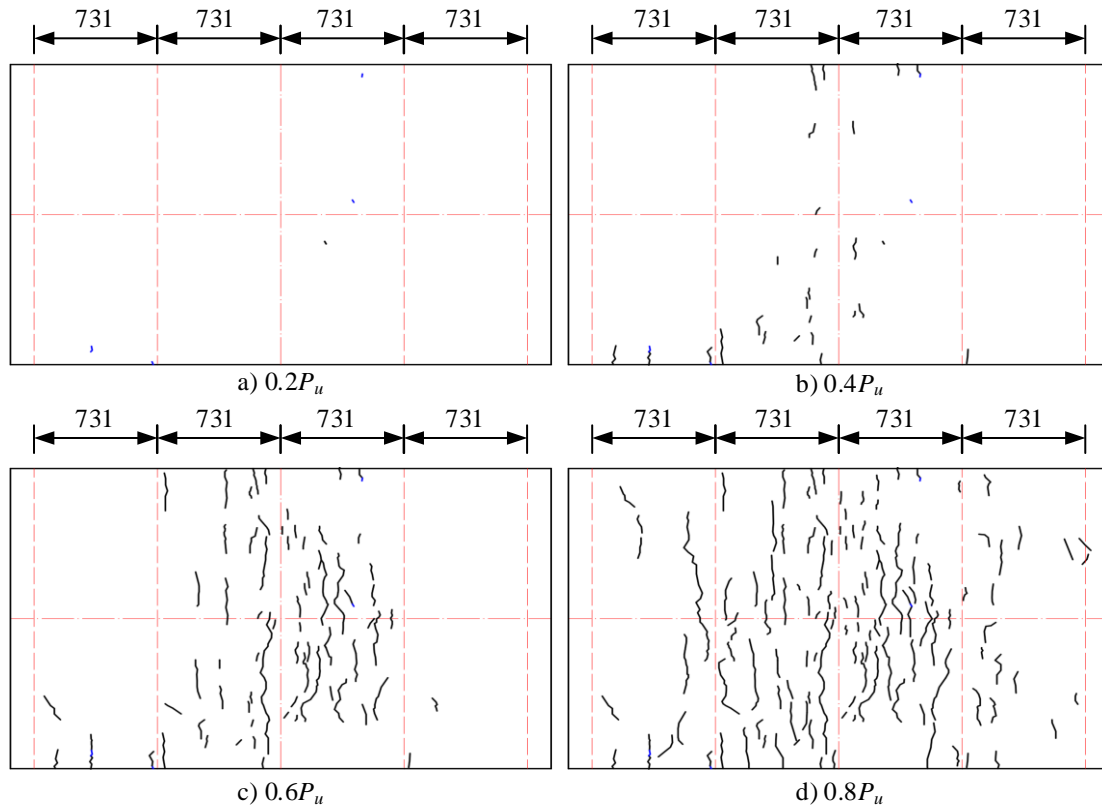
Cracking development of specimen GCRP (Unit: mm)
